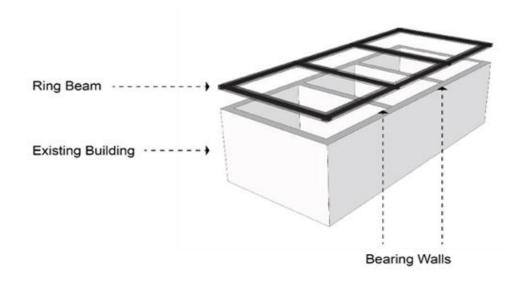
Ring beam / RC Platform connecting all bearing walls of the existing building[8]
